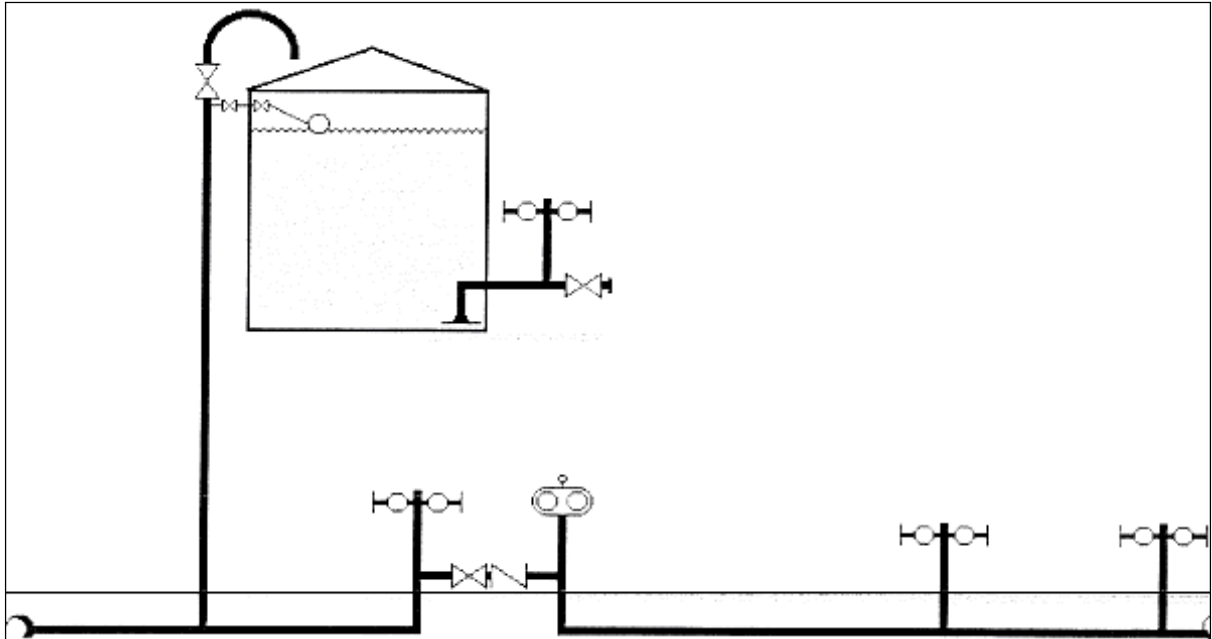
Typical sectional elevation of an above-ground external storage tank showing fill and quick-fill arrangements (taken from AS 2419.1 Figure 5.2.3)
